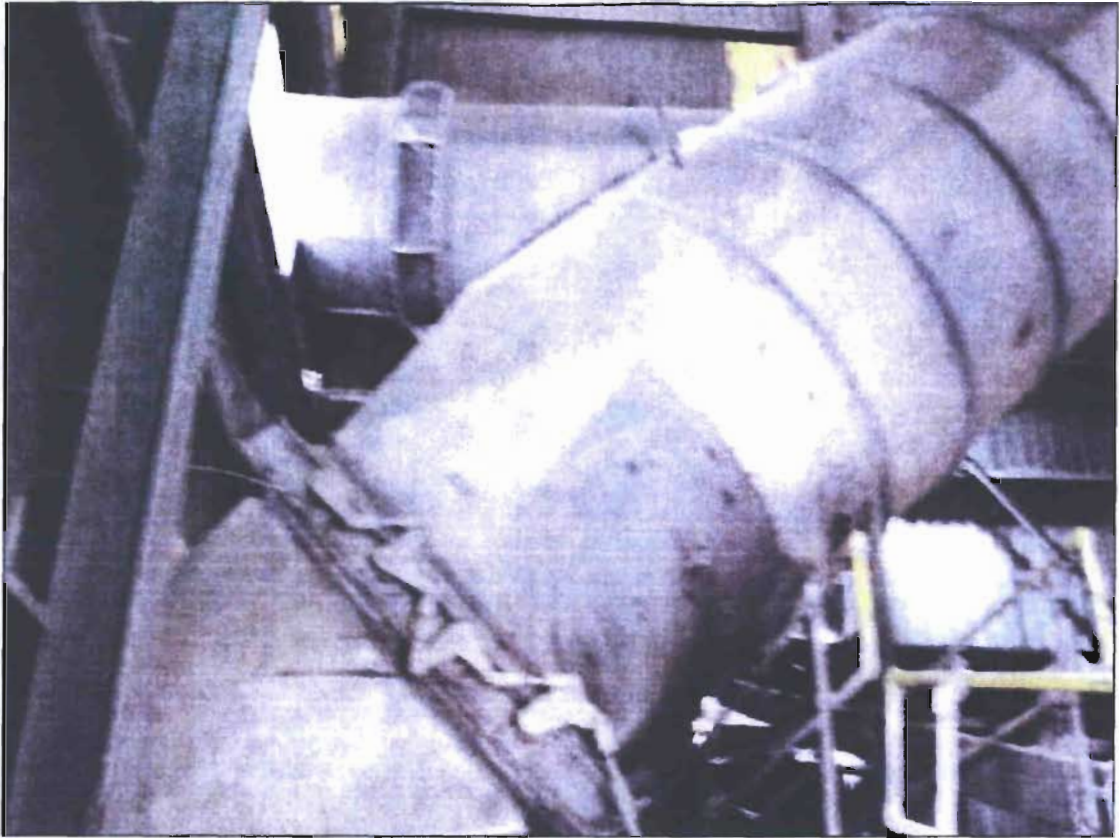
Raw Mill #2 2323 Damper top, 2319 Damper bottom.
